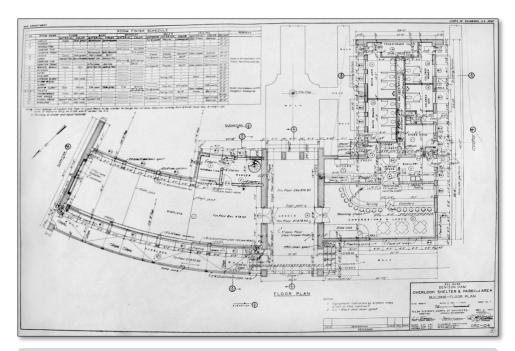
Overview of 1947 floor plan for the proposed overlook station.
